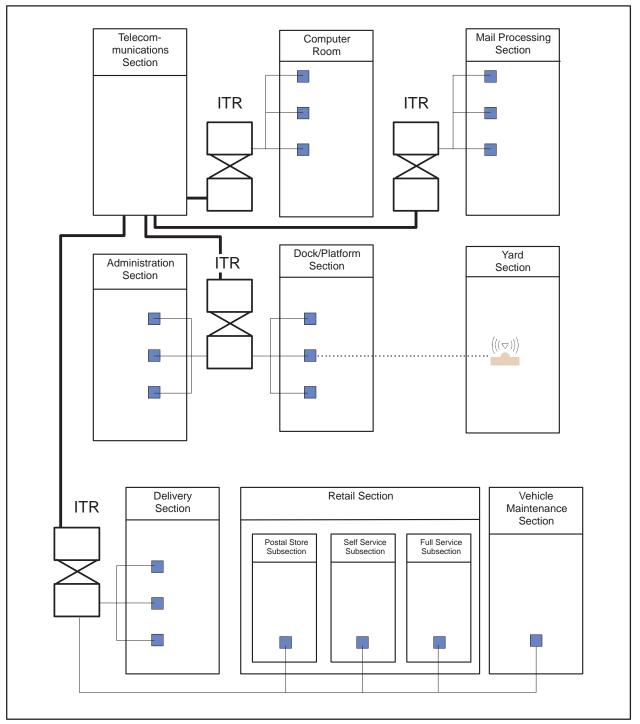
Mixed Technology Building Backbone Wiring Template
